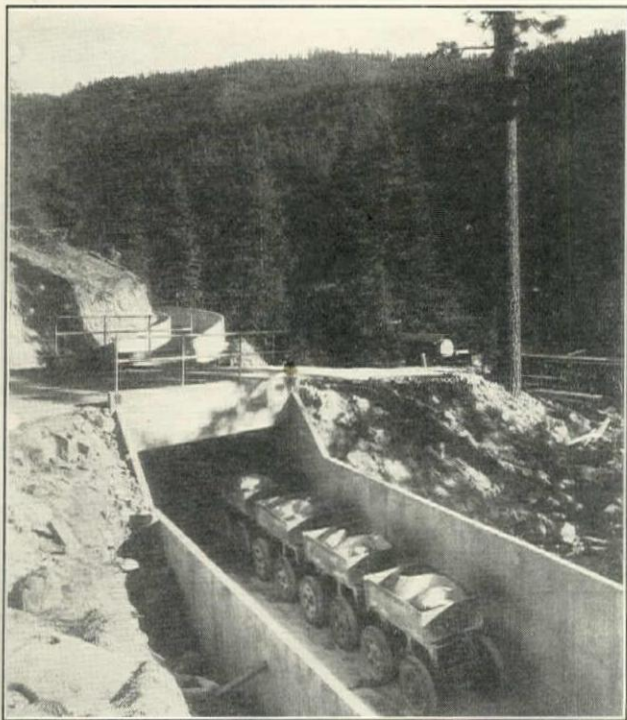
Concrete Slab Road Bridge Across Flume, with Train of Concrete Aggregate Trailers and McCormick-Deering Industrial Tractor Passing Underneath
